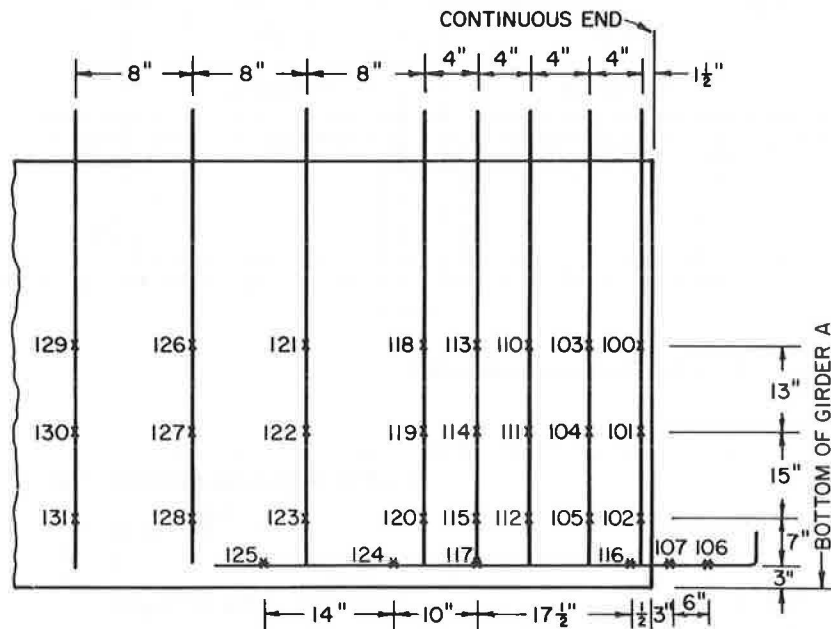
Configuration of strain gauges on stirrups of Girder A.
